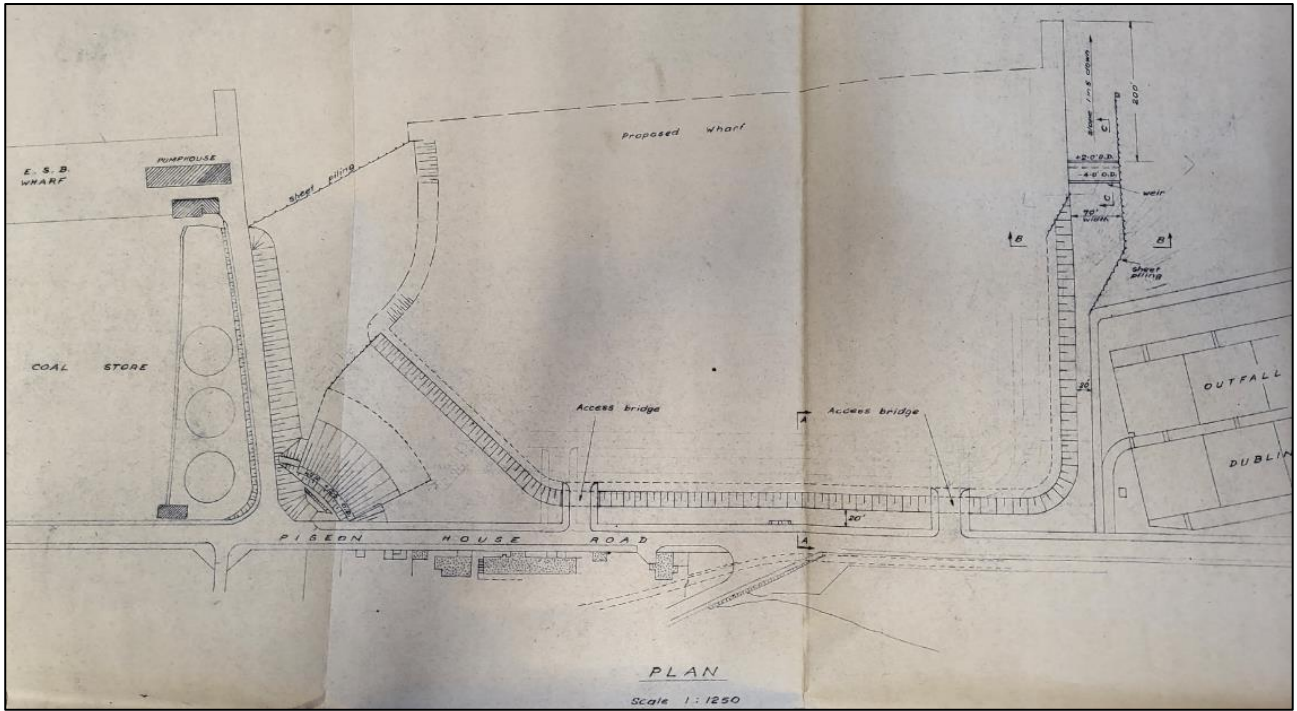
Ringsend Generating Station – C.W. Culvert Outfall Preliminary Drawing 25-05-1965
